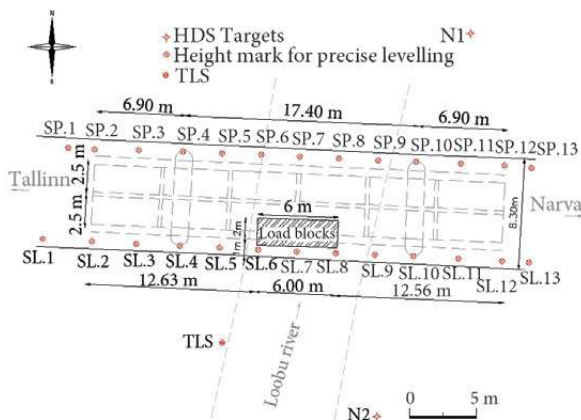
Locations of the levelling height marks, TLS station, HDS targets and the load blocks. The bridge columns and cantilever beams with beam supports are exhibited by dashed lines
